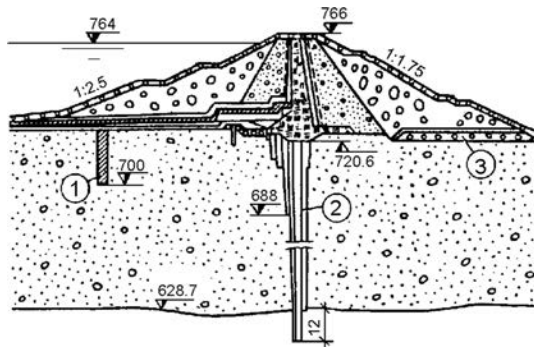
The Sylvenstein dam (Germany) with a grout curtain through deposit of gravel in the foundation (after Grishin et al., 1979). (1) Concrete cut-off trench for lengthening the seepage path; (2) grout curtain; (3) horizontal drainage for control of the curtain's effectiveness.
